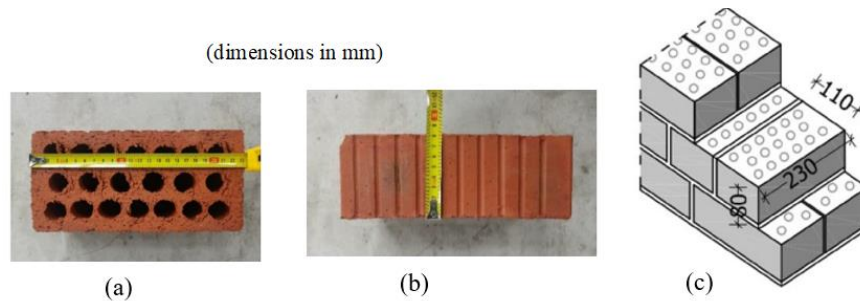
Brick units: (a) top view (b) side view and (c) arrangement of the masonry for specimen (FIF).
